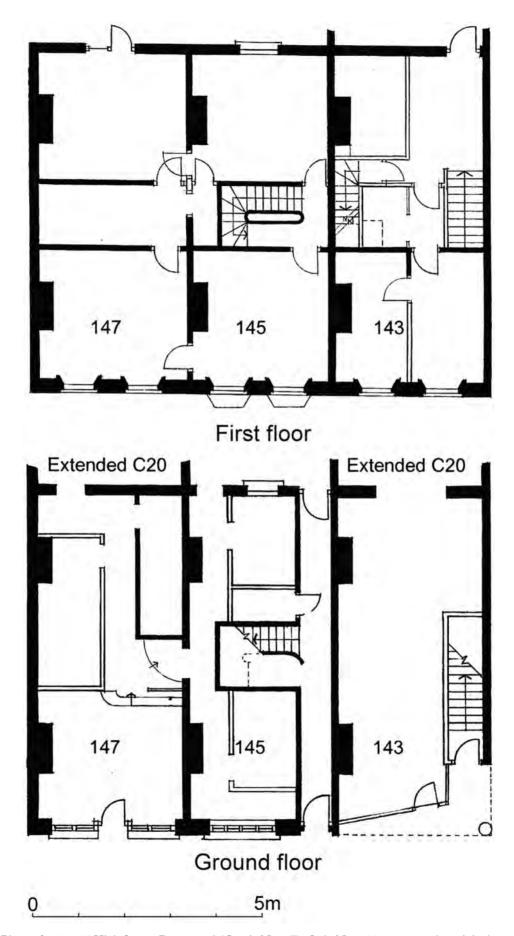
Plans of 141–145 High Street, Brentwood (Corrie Newell). Only No. 145 preserves the original ground plan
